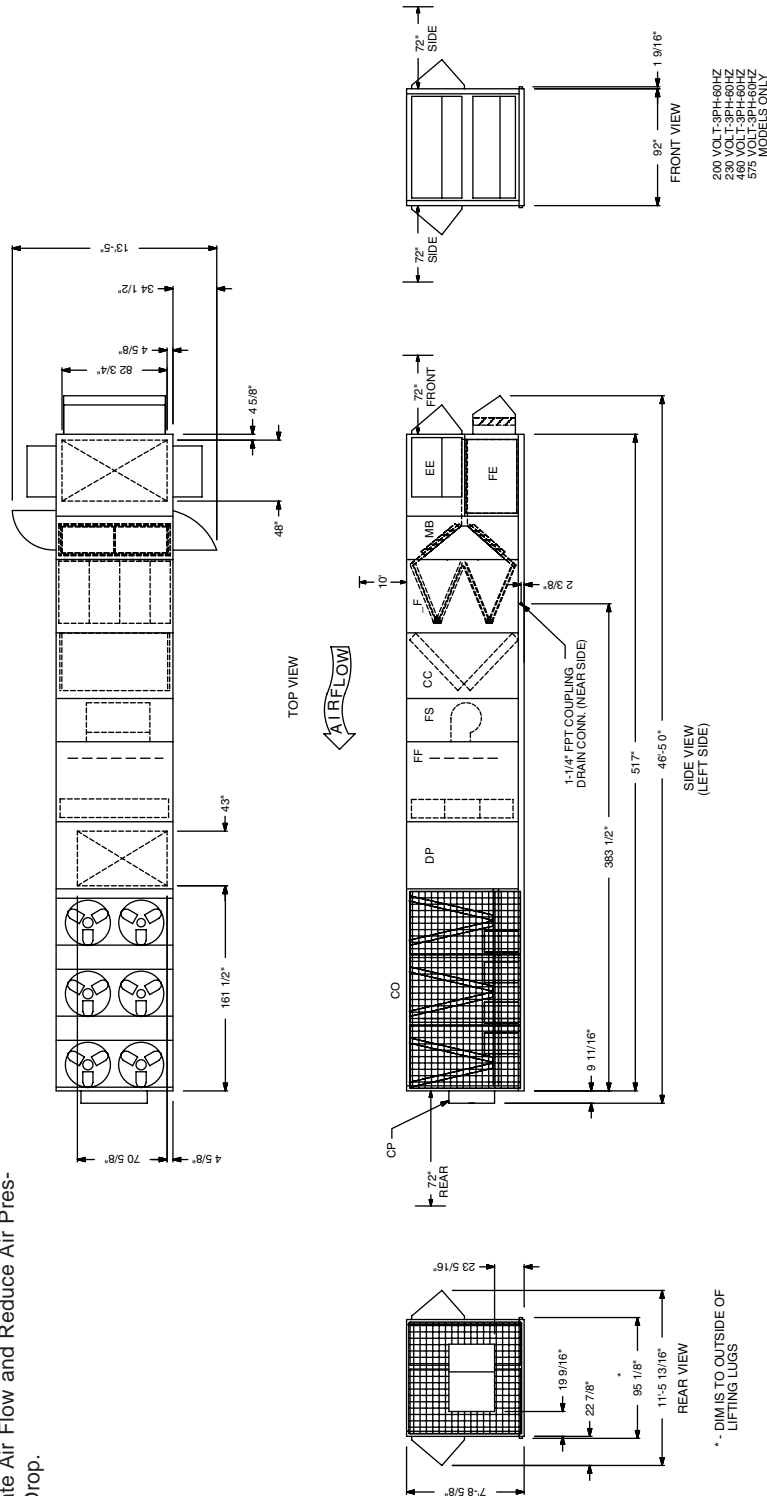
GENERAL ARRANGEMENT DRAWING
